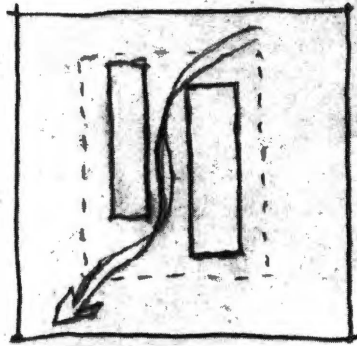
TN cantilevered barn - 2nd story access as stacked ventilation
